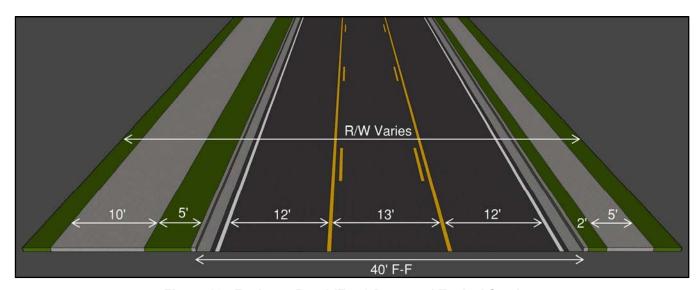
Ft. Jesse Road (East) Proposed Typical Section
